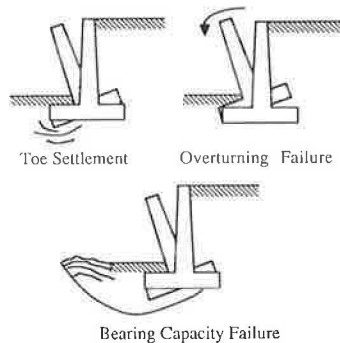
Forward tilting failures of cast-in-place concrete walls.
